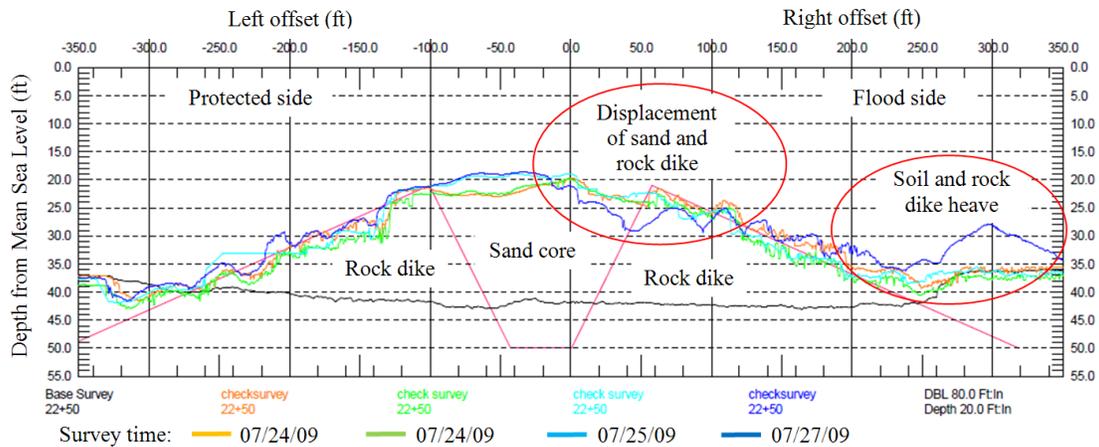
Bathymetric surveys of as-built cross section of MRGO Berm at STA 22+50
